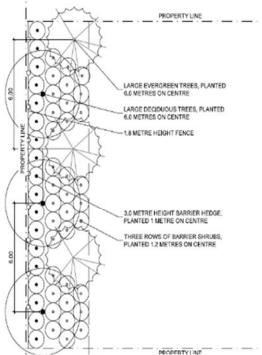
Example of vegetated buffer landscape plan for 4 m width, adjust plantings to accommodate 6 m or 8 m vegetated buffer width.
